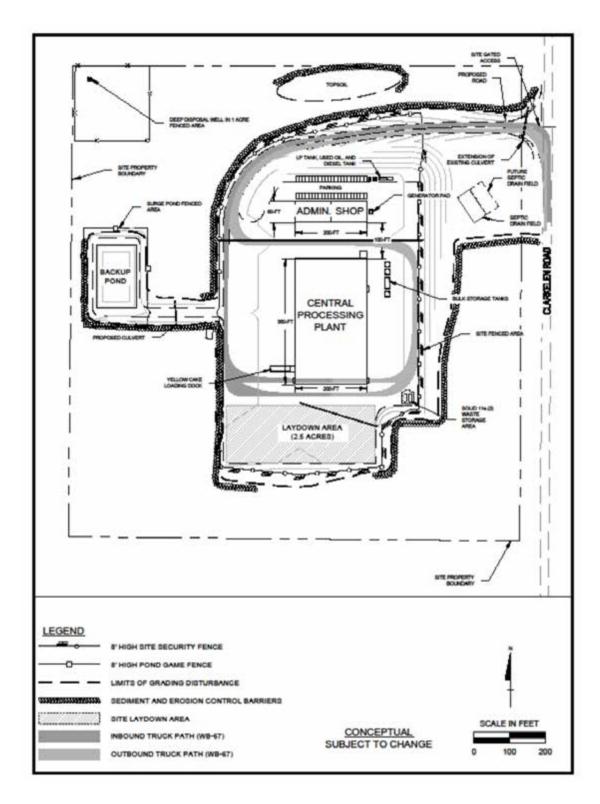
Proposed Reno Creek ISR Project CPP Facility Layout (AUC, 2014a)
